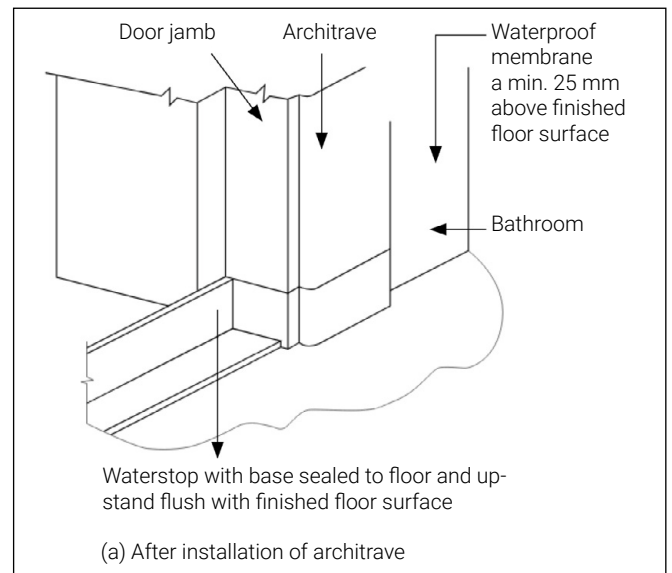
Typical bathroom door detail for bathroom perimeter flashing waterproofing – ABCB Housing Provisions Figure 10.2.24
